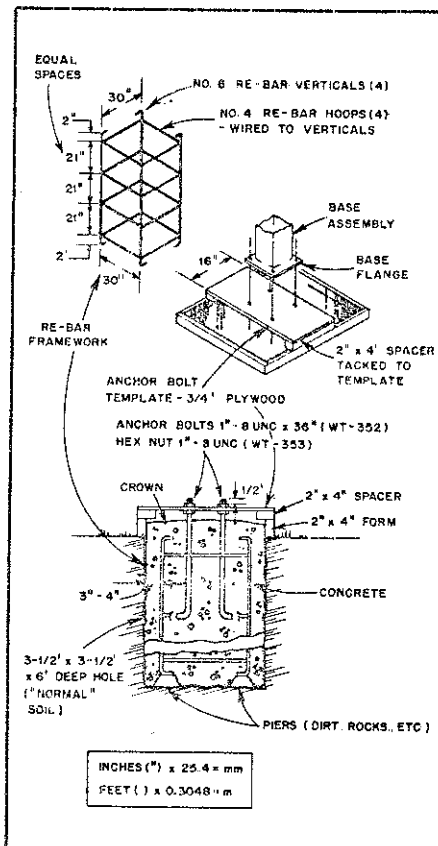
Plans for installing concrete base for Wilson ST-77B. Although the instructions and dimensions will vary from one tower to the next, this is representative of the type of concrete base specified by most manufacturers.
